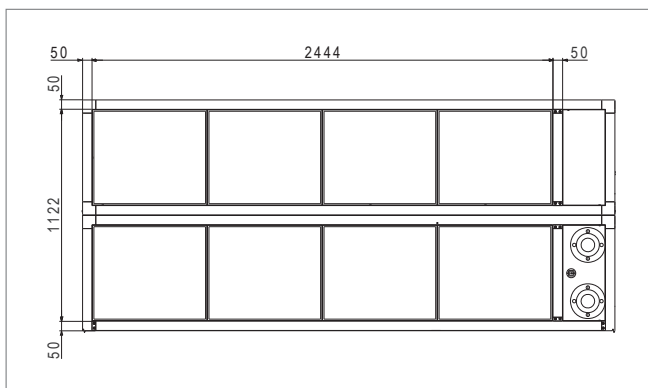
Dimensional drawing extract air duct (dimensions in mm, inspection opening for filter changes)
